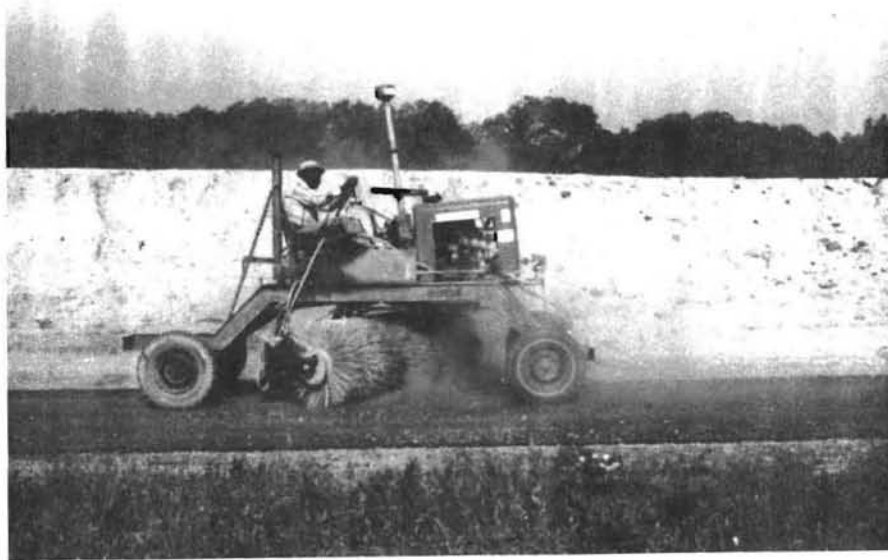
Sweeping of the asphalt pad before construction of the slabs.
